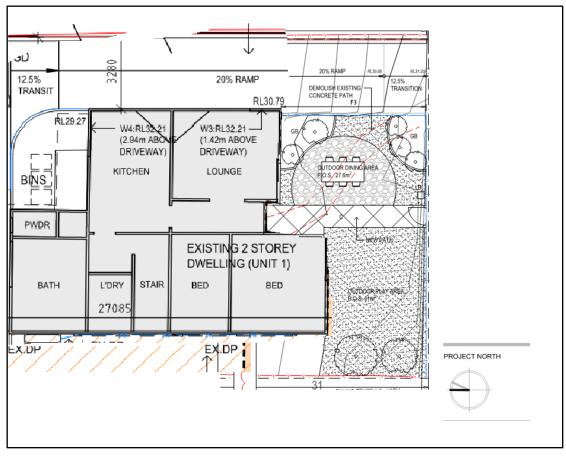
Composite image demonstrating the applicants' proposed arrangement of private open space for Unit 1 and north (grey in north point diagram).
